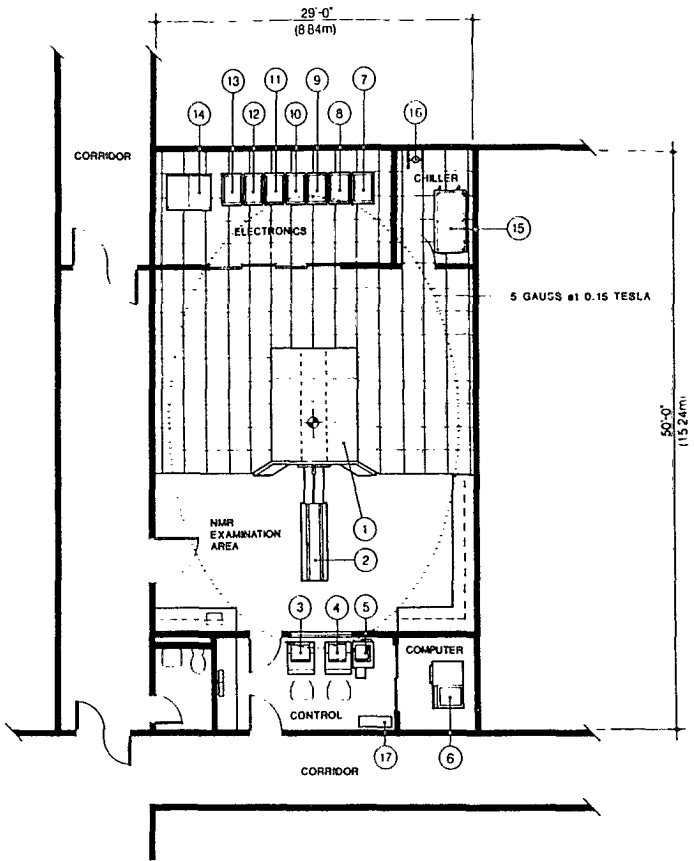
Typical Magnet Installations from the Picker Site Planning Guide (13).
